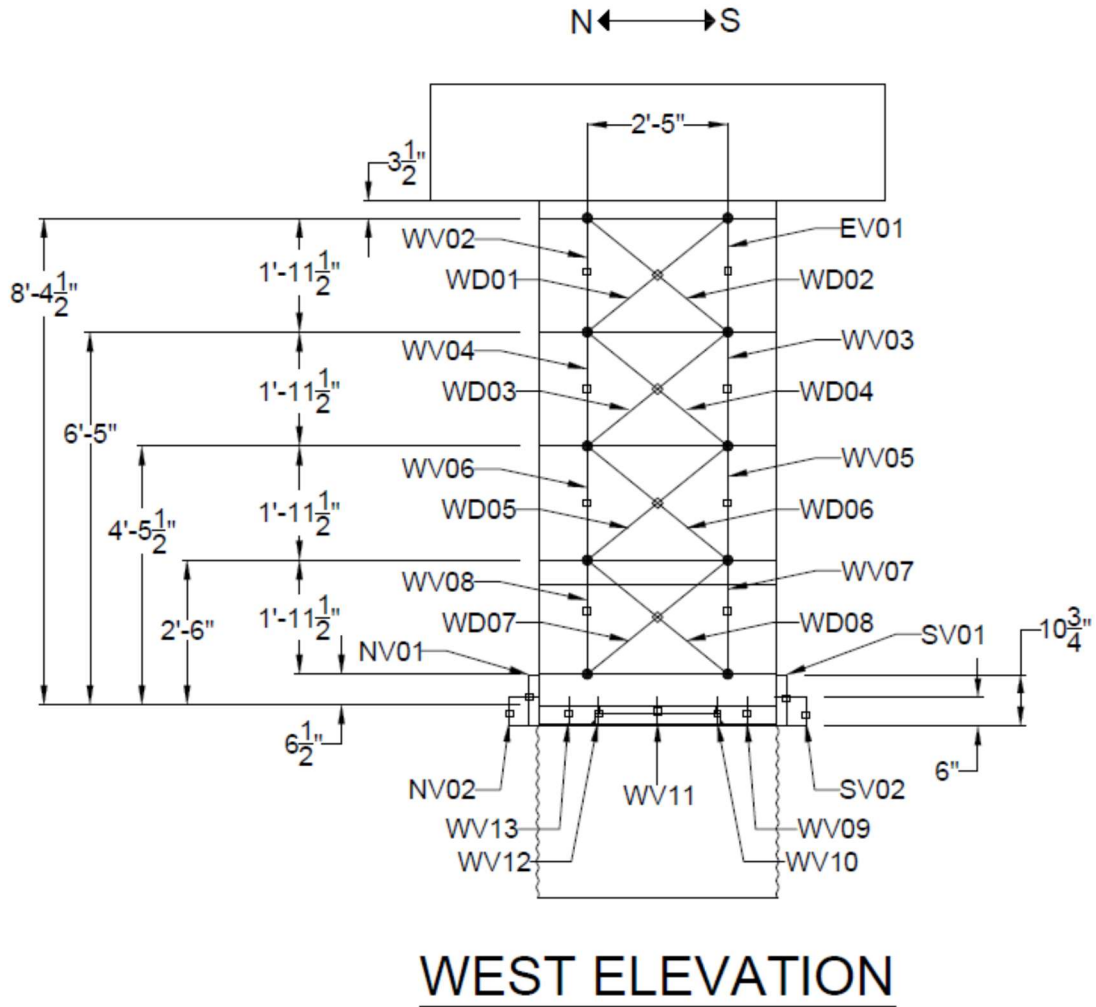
Linear potentiometers locations for Specimen 1 (west elevation)
